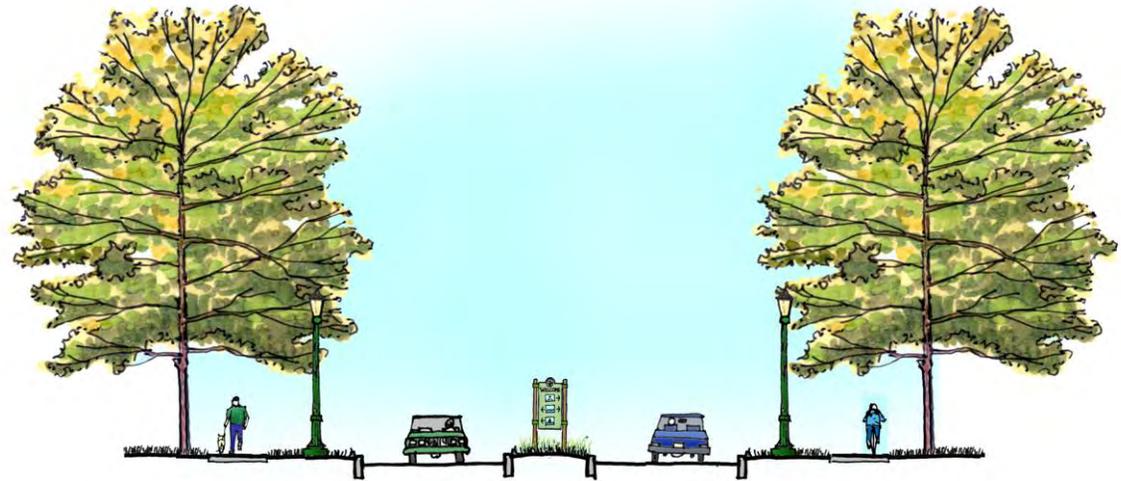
Cross section of the entrance to the Village on South Park. A 10' wide boulevard and two 15' travel lanes should be built. The extra wide road right of way also accommodates an 8' buffer and 6' walk on both sides. New street trees and lights should be installed along the gateway.
